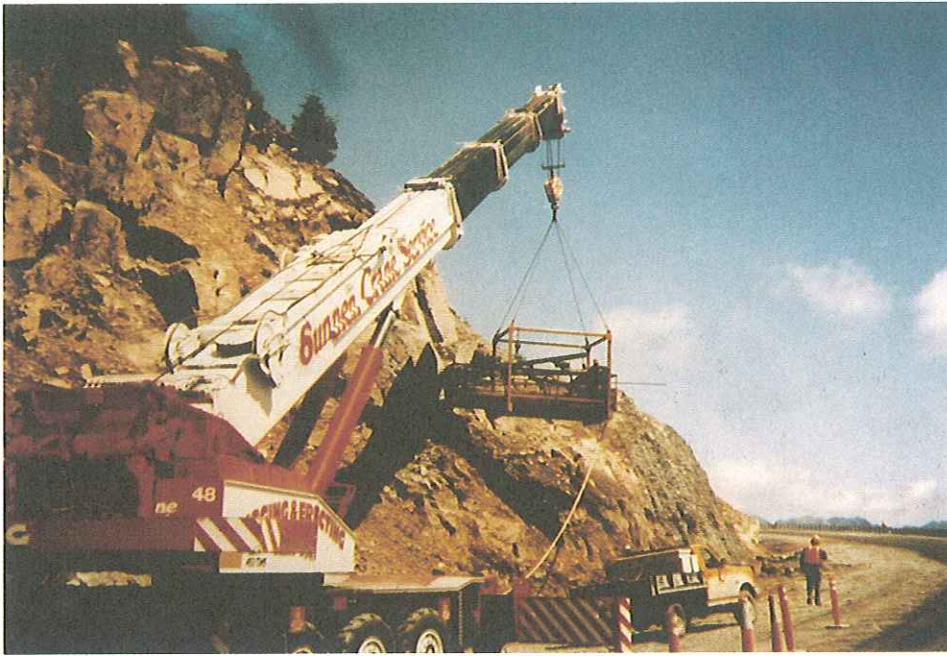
Work was performed from a large telescoping crane with a work platform (Courtesy Washington Department of Transportation).
